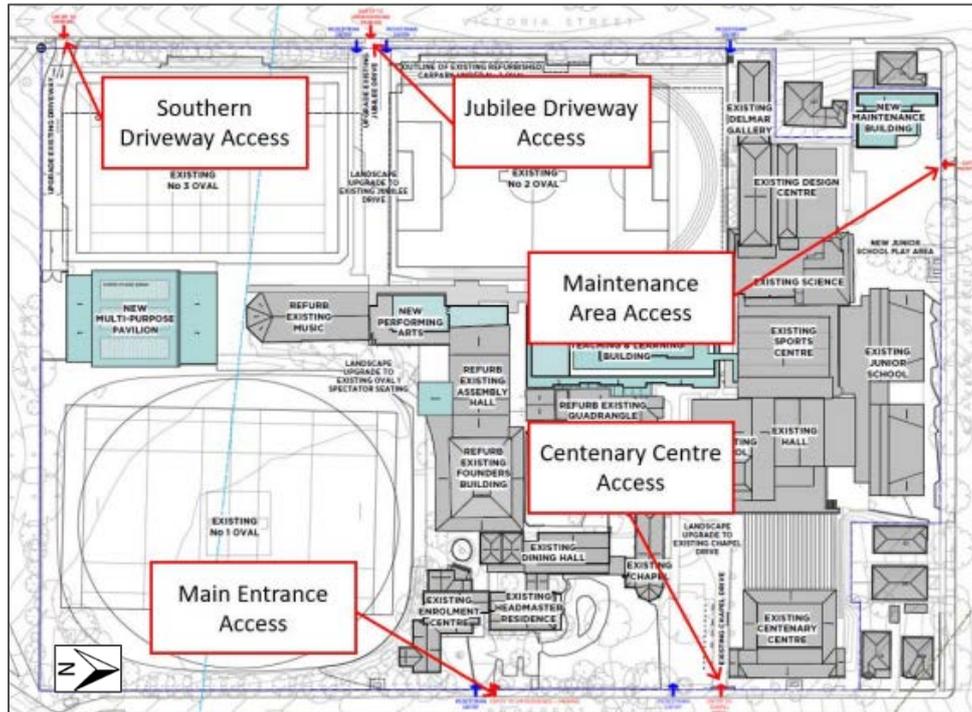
| Existing / proposed vehicular access (Source: Applicant's EIS 2020)
